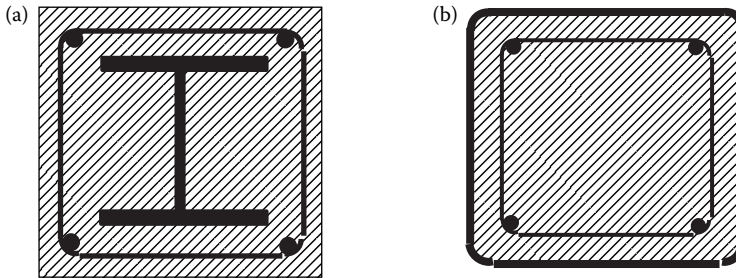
Concrete encased open sections and concrete infilled tubular sections. (a) Fully encased section. (b) Infilled section.
